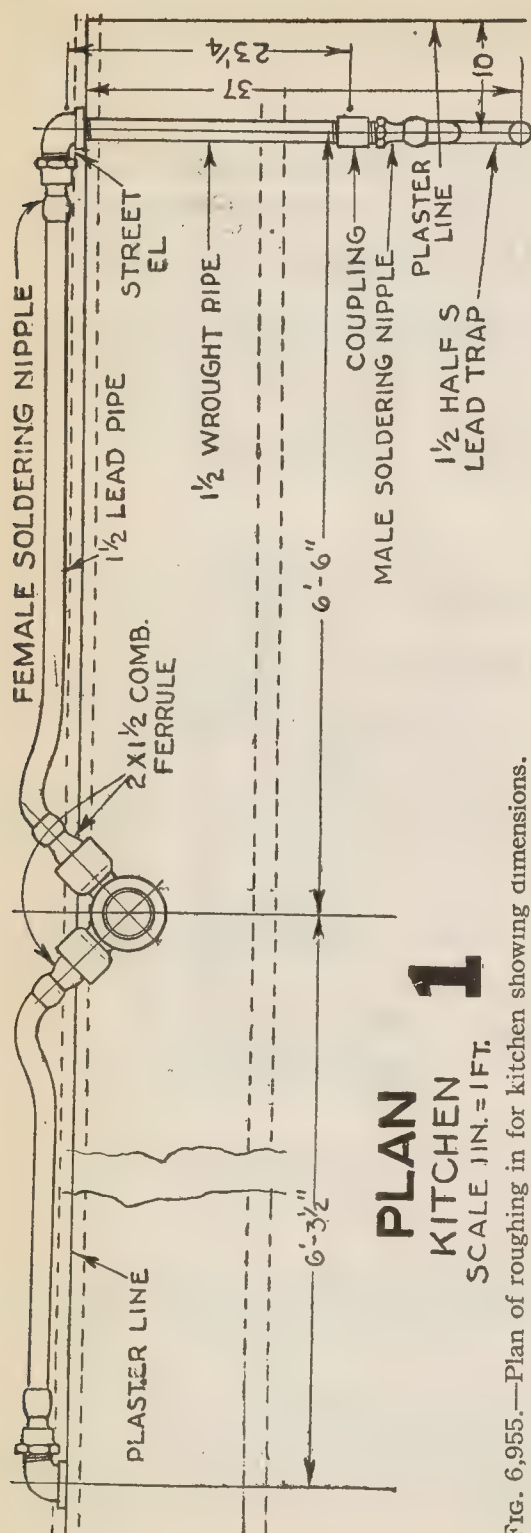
,955.—Plan of roughing in for kitchen showing dimensions.
